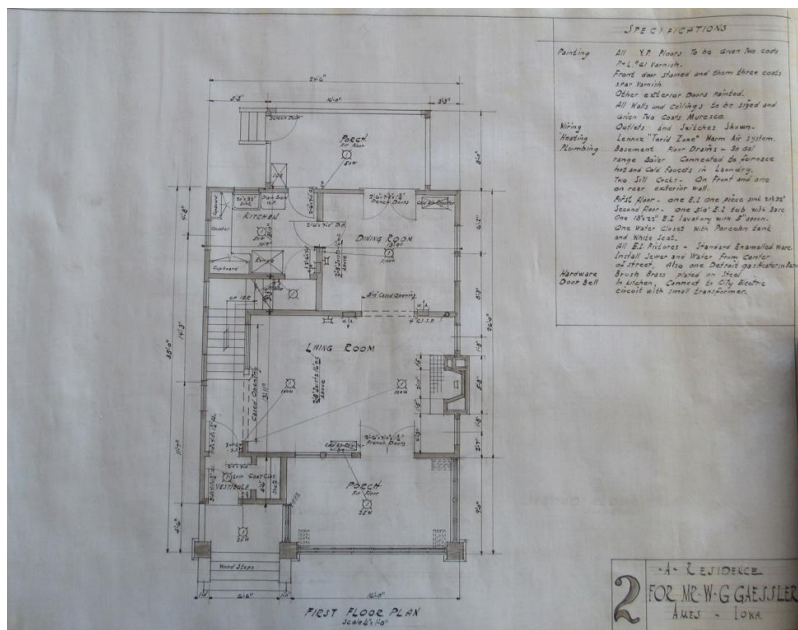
1212 Park Way, Ames, Iowa, First Story Floor Plan. Print courtesy of David R. Russell.
